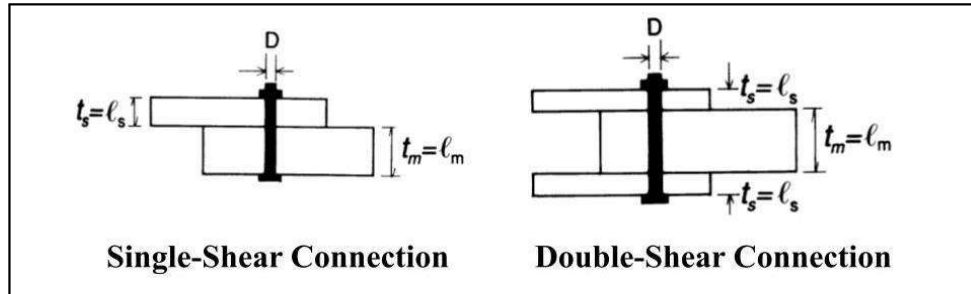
Typical NDS Dowel-Style Connection Setups [77]
